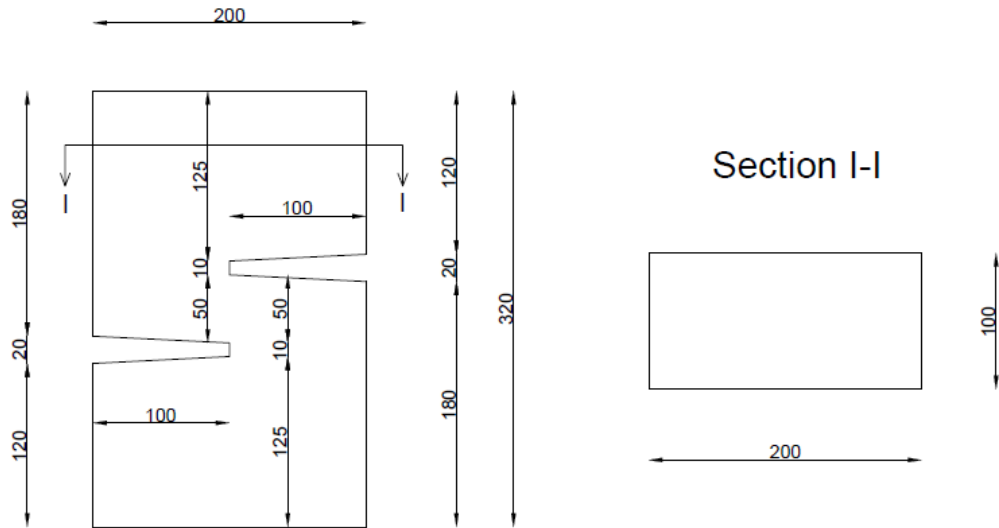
Dimensions of “Z”-shape test specimens (unit in mm)
